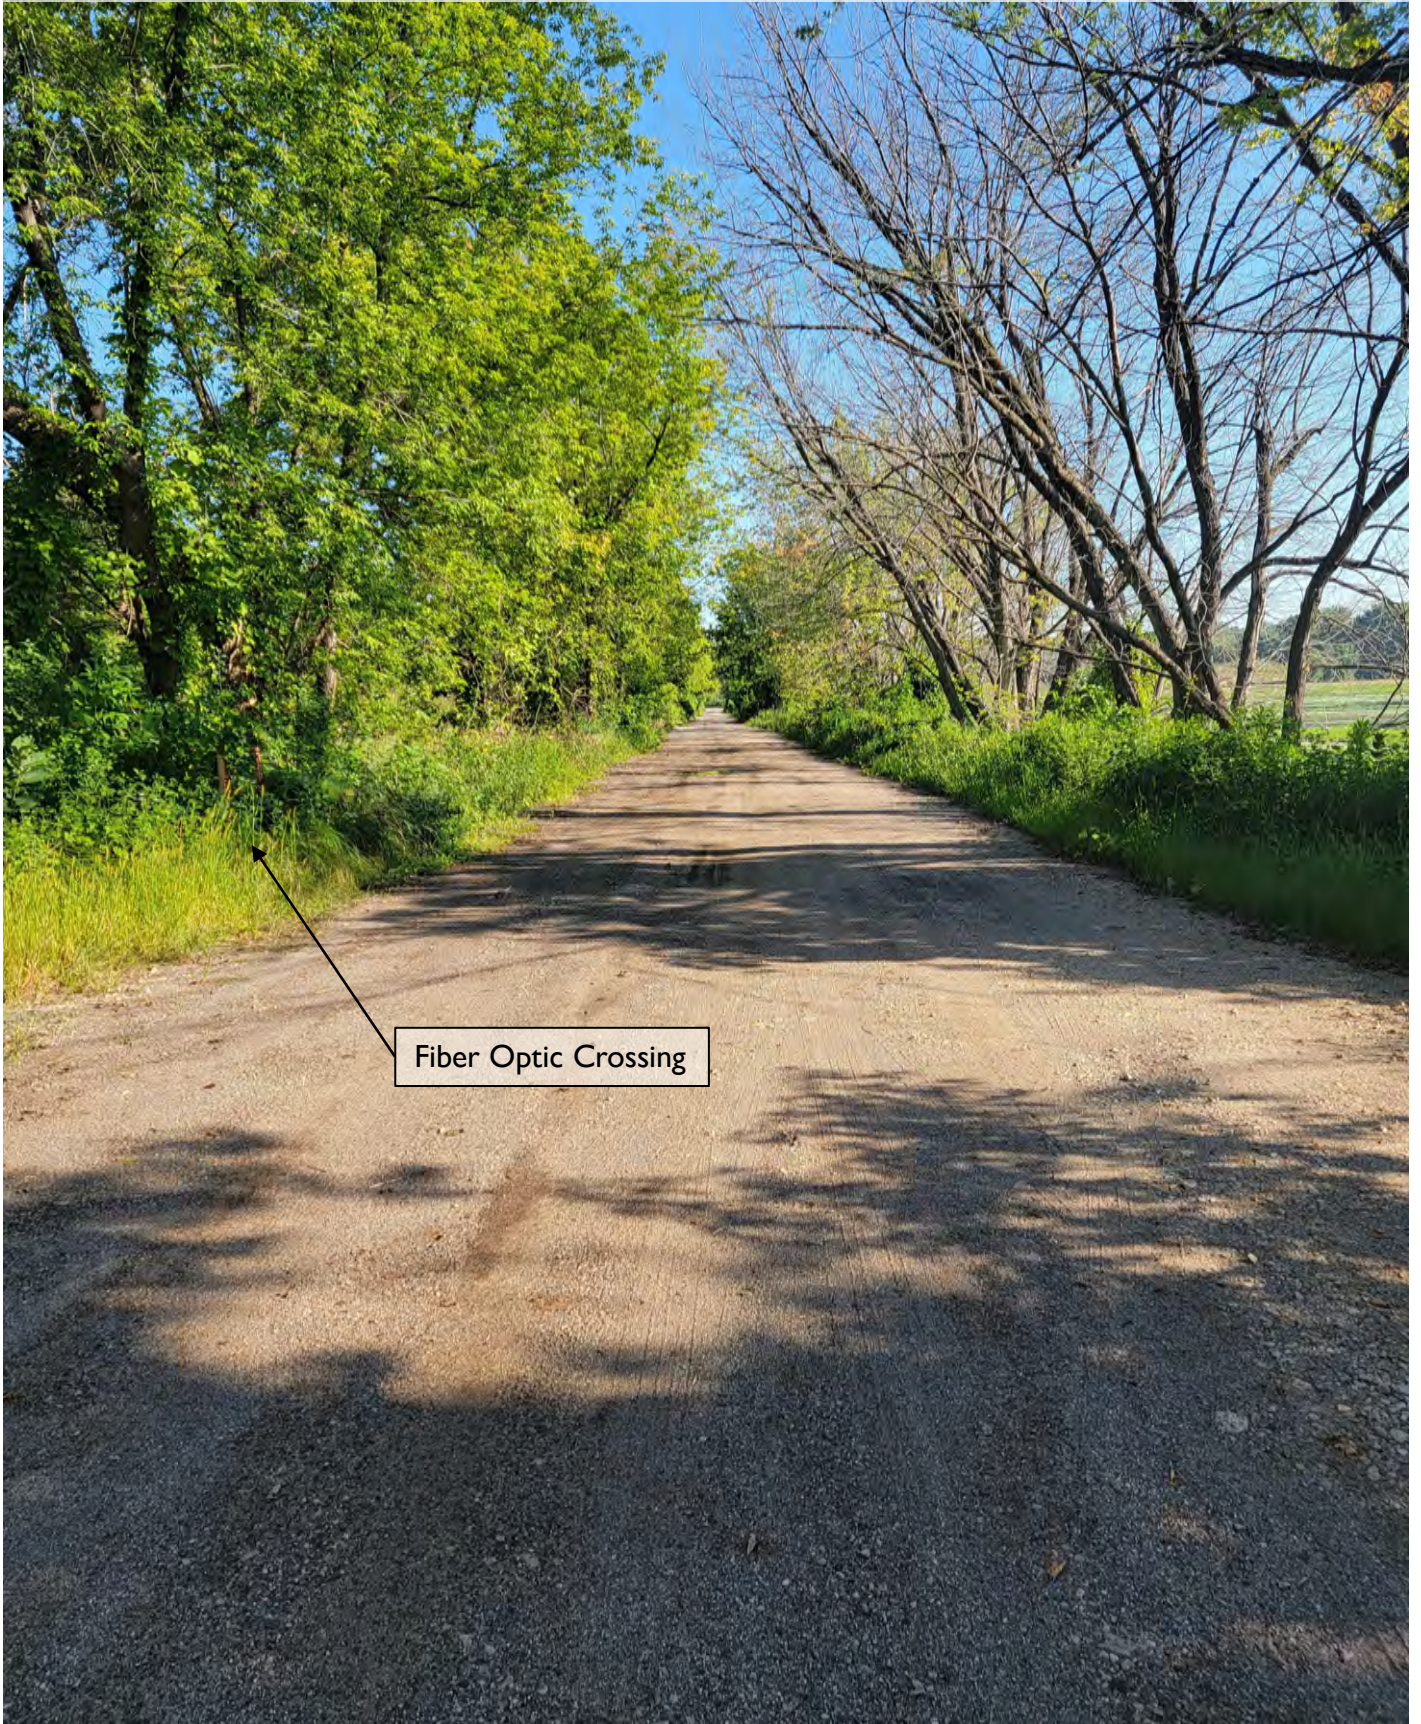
Vernon Avenue looking north from railroad crossing. In 2015, AET soil boring B-2 indicated the roadway had a 2.5-inch deteriorated bituminous pavement surface.
